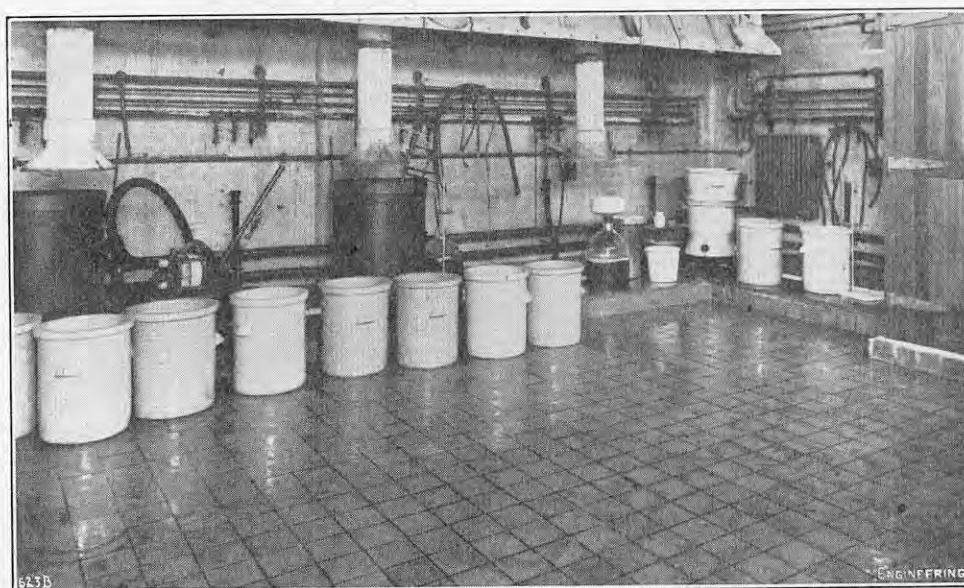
CONCRETE FLOOR PROTECTED AGAINST ACID.
